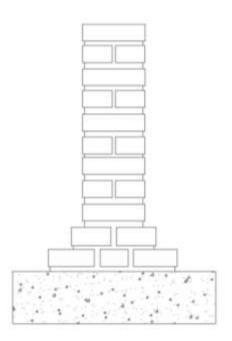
Piles of bricks to form the load bearing walls of *Istana Bandar.
